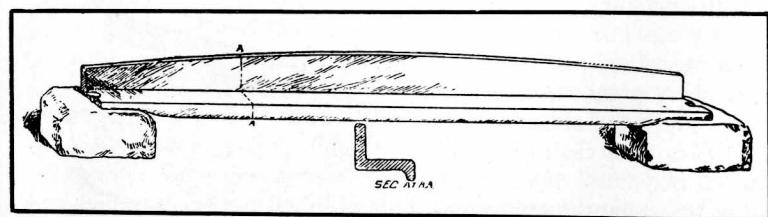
Plate rail. 3-feet long, made of cast iron, with an upward projecting flange to accommodate either cart or flanged wheels.
